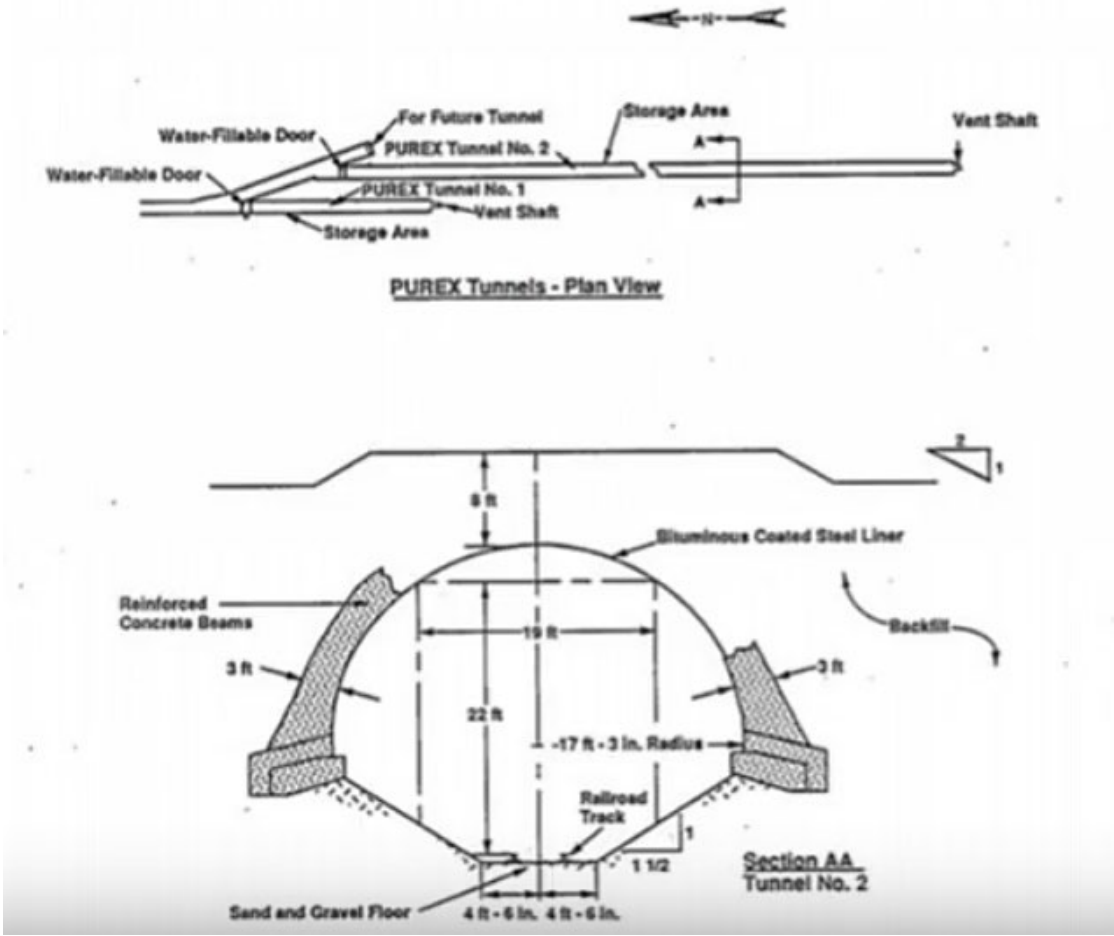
Tunnel 2 configuration with bituminous-coated steel liner and reinforced concrete beams.
